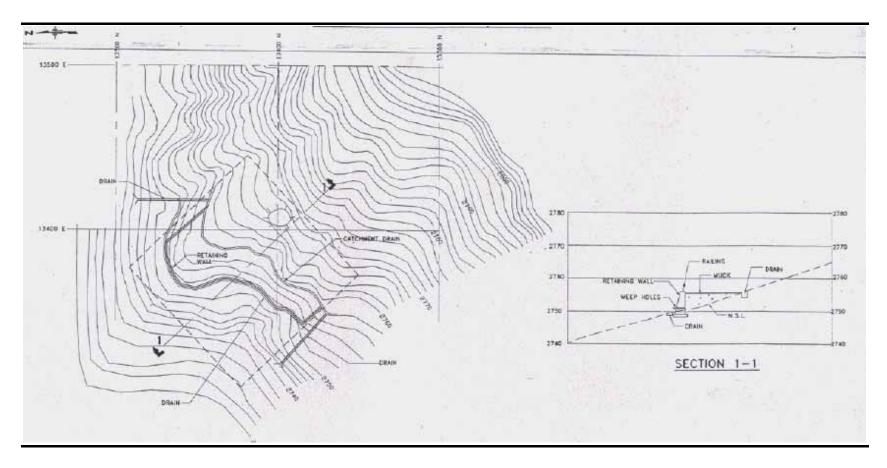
Plan and section of Plant Area (PA-1c) near Allain Head race tunnel Adit – I showing muck disposal arrangement Plant Area: 1 ha for 12000 m3 of Muck Reuse
